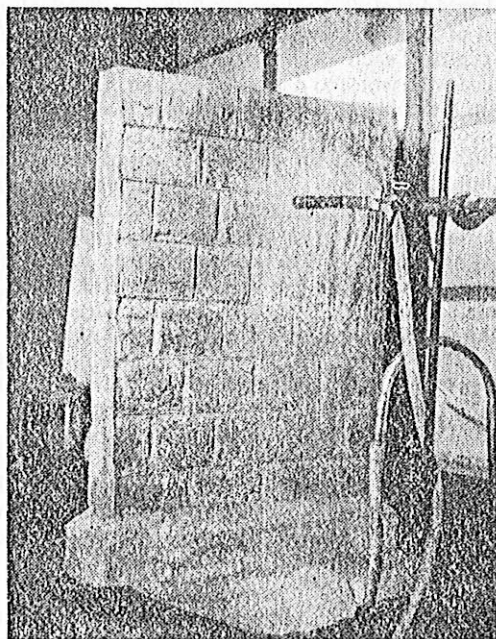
Cut brick masonry wallet 600 x 500 x 50mm with 1:6 cement-sand mortar joints under spray test
